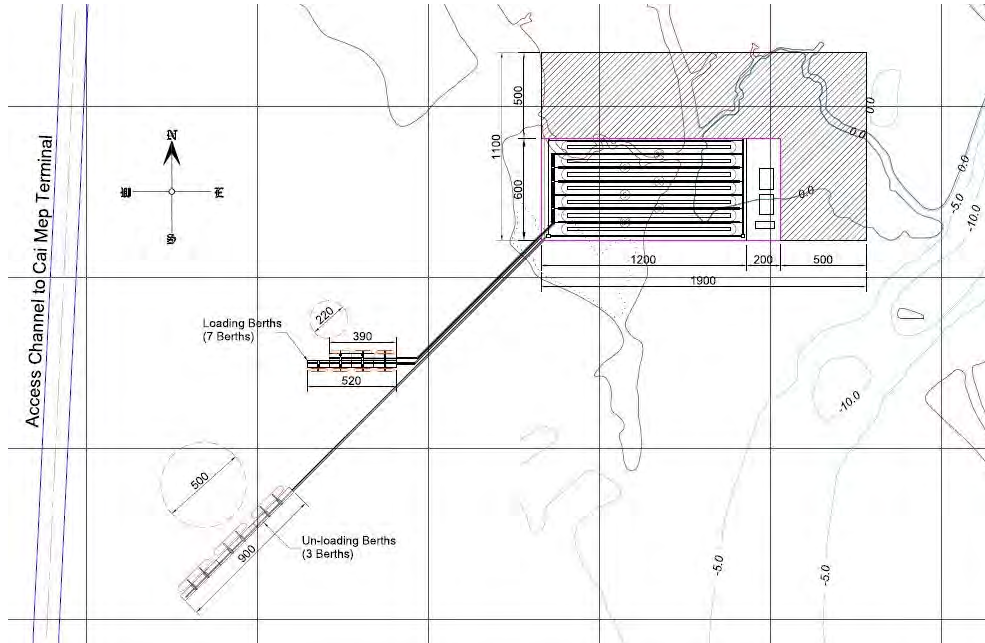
Layout of Fixed Type Imported Coal Transshipment Terminal in Cai Mep
